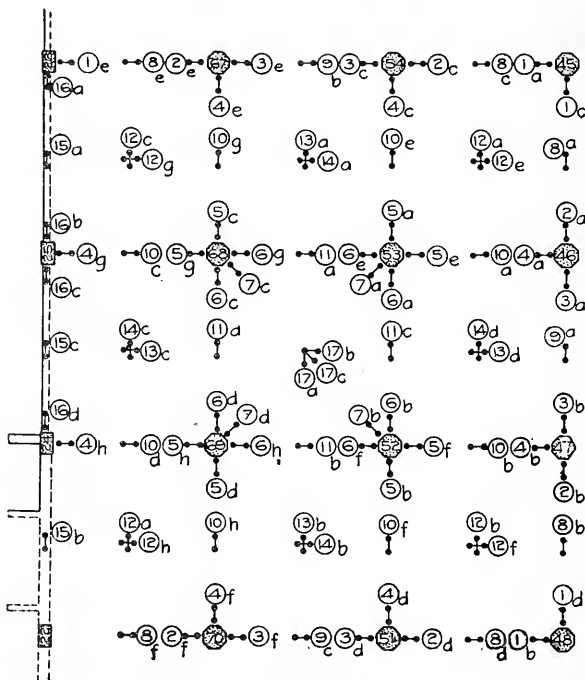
KEY TO GROUPING OF GAGE LINES; TEST FLOOR OF SHREDDED WHEAT FACTORY.
